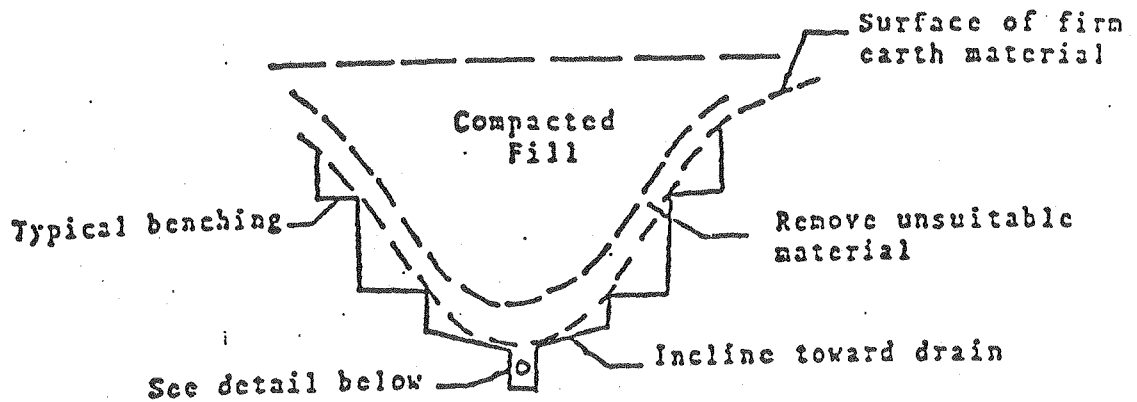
B Typical Subdrain Cross-Section Details
